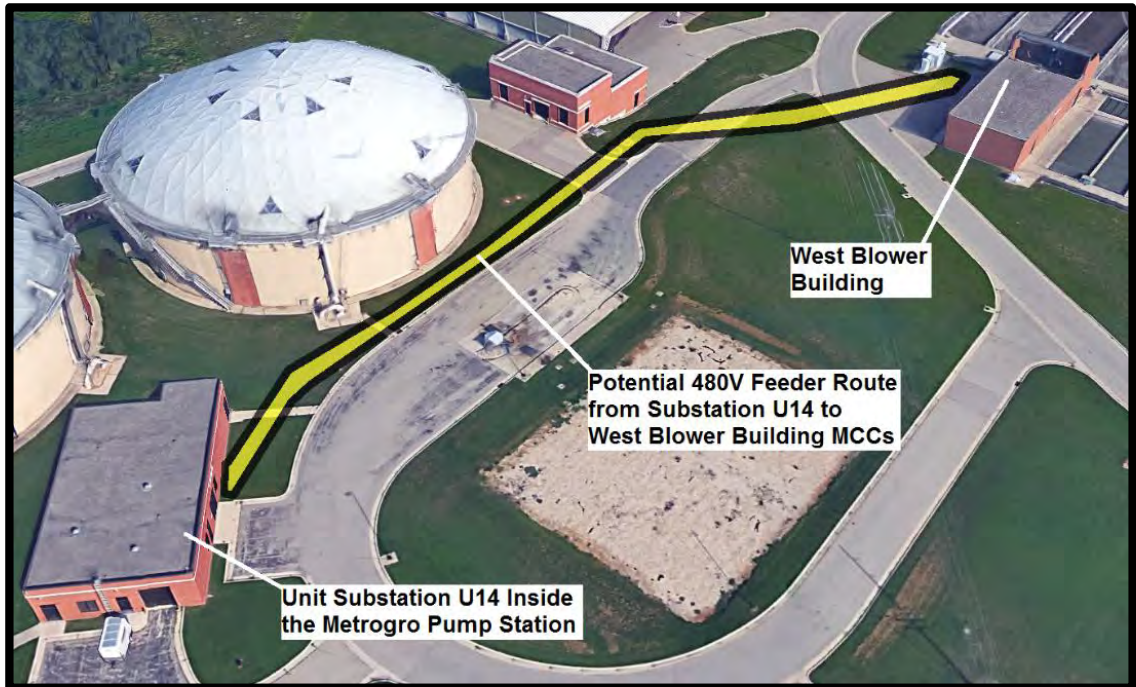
Alternative USUB No. 3—Duct Bank Routing from Unit Substation U14
